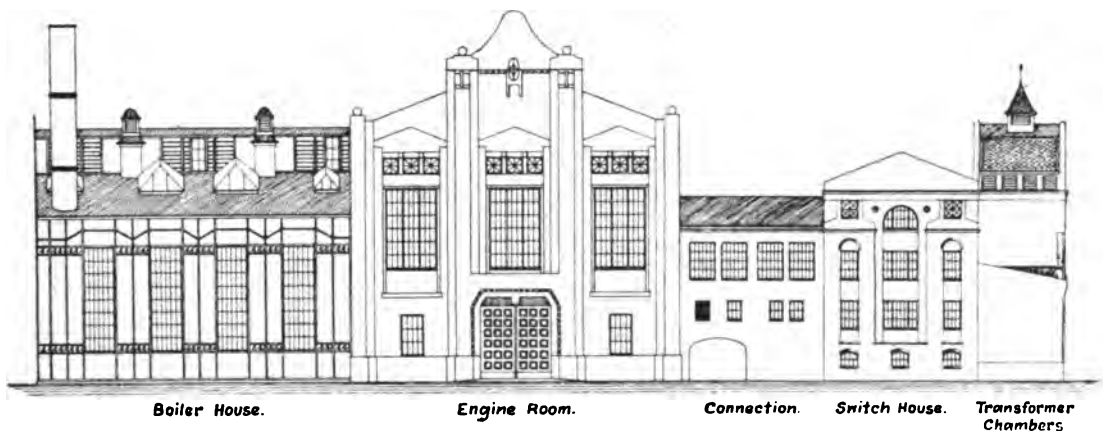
Architectural Example—Façade of the Hattingen Electricity Works.
